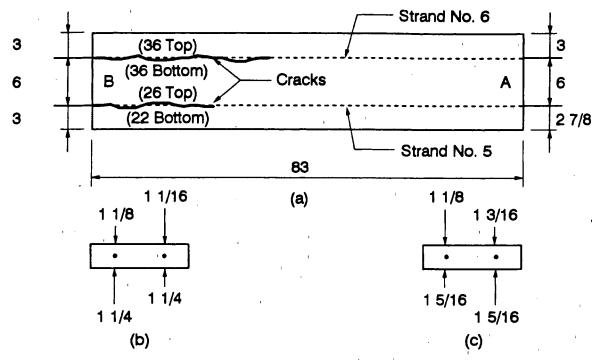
Specimen No. 3-2.5TC-3 (dimensions shown in inches):
